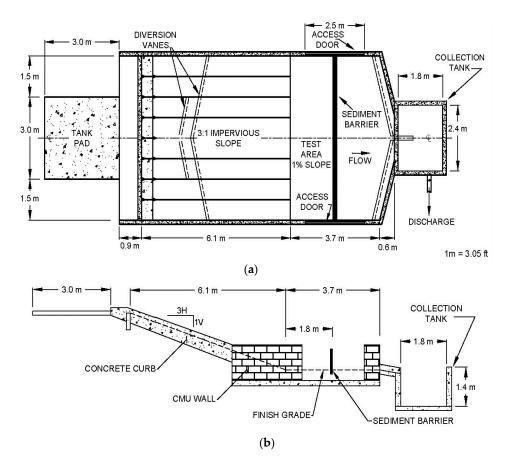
Plan and profile views of the test apparatus [7], (a) plan view, (b) profile view.
